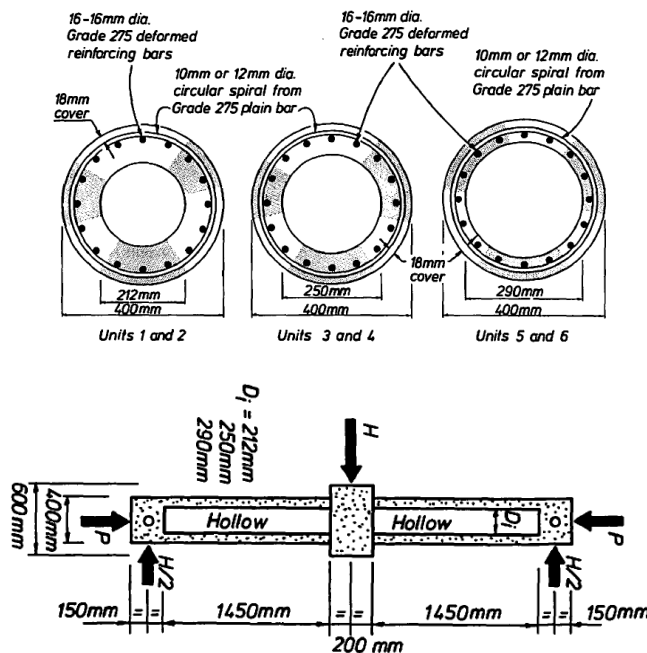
Geometry and reinforcement details, Zahn et al. (1990)
